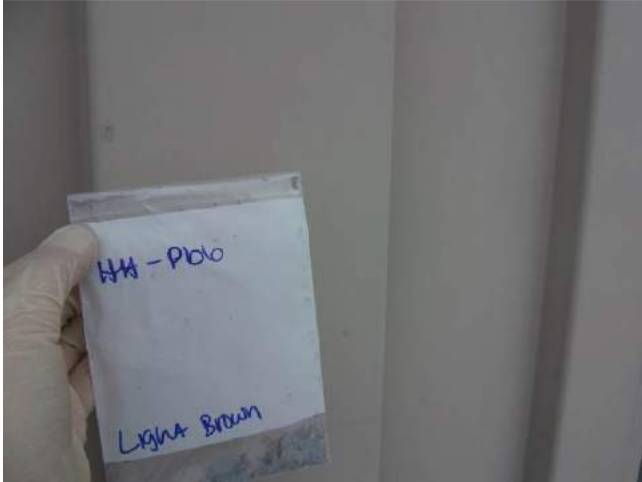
Helicopter Hangar Building at CCGB Prescott
